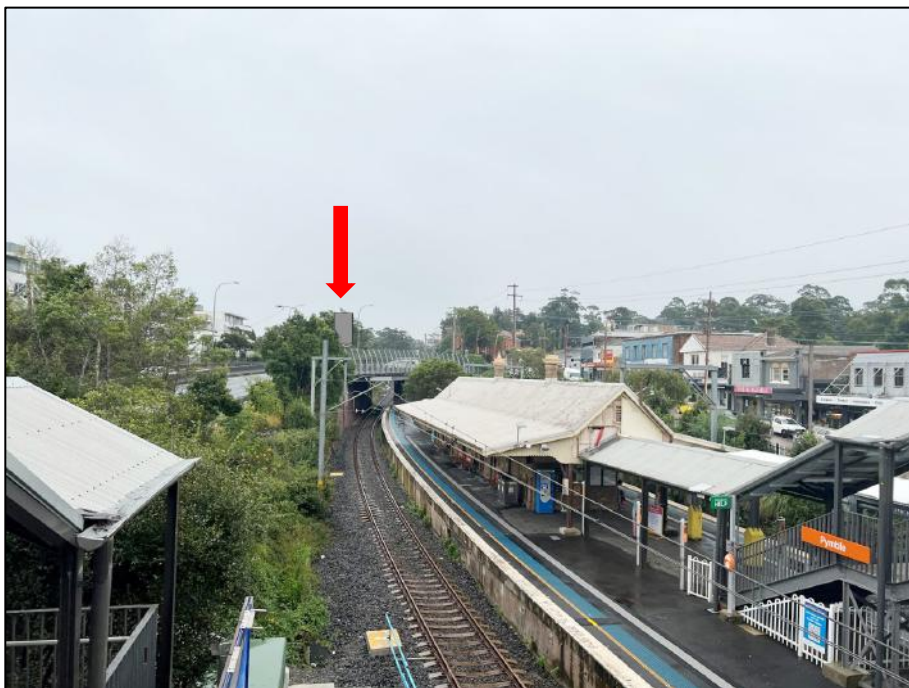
Looking towards the proposed signage from the Pymble Footbridge.
